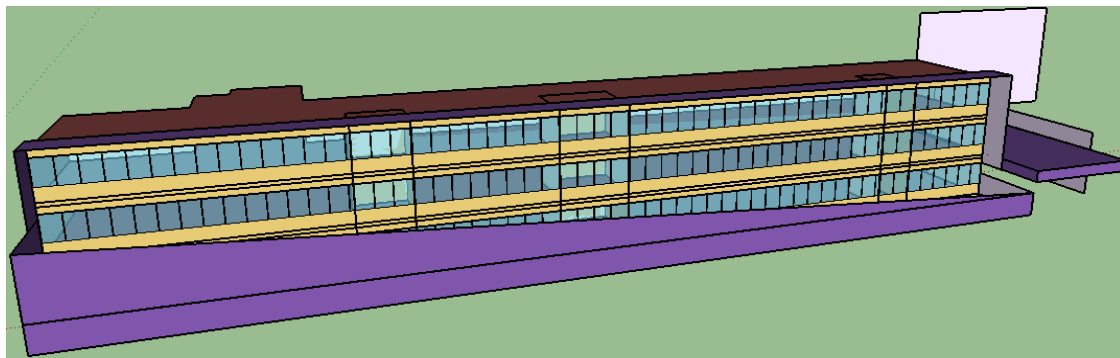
Sketchup model of the Seixal City Hall (north wing)
